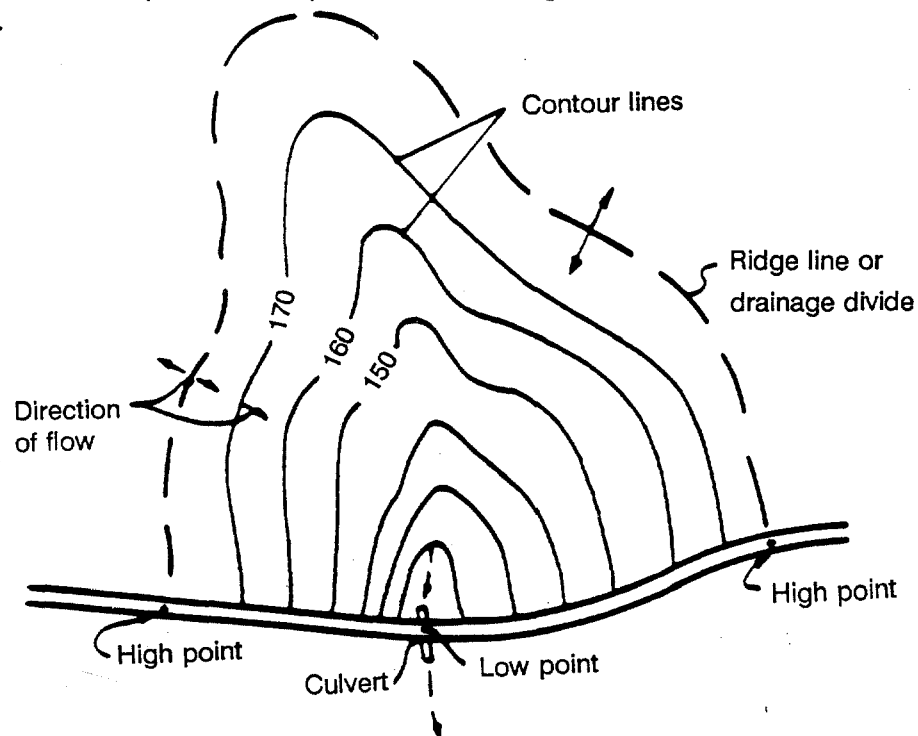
Drainage area served by a culvert. ⁽³⁾
